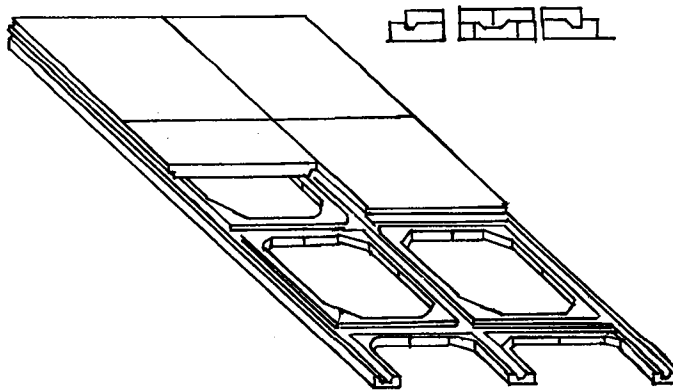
PREFABRICATED SLABS ON PREFABRICATED GRID FOUNDATION
